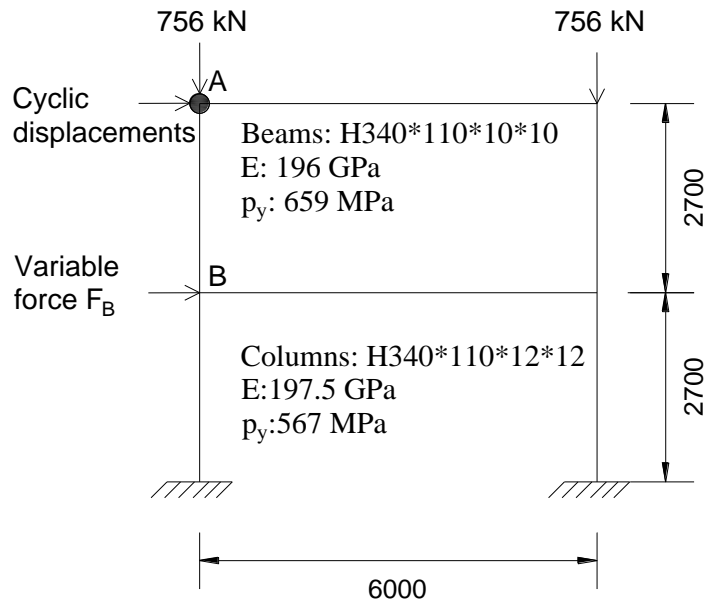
Layout and loading pattern of the high strength steel frame (Unit: mm)
